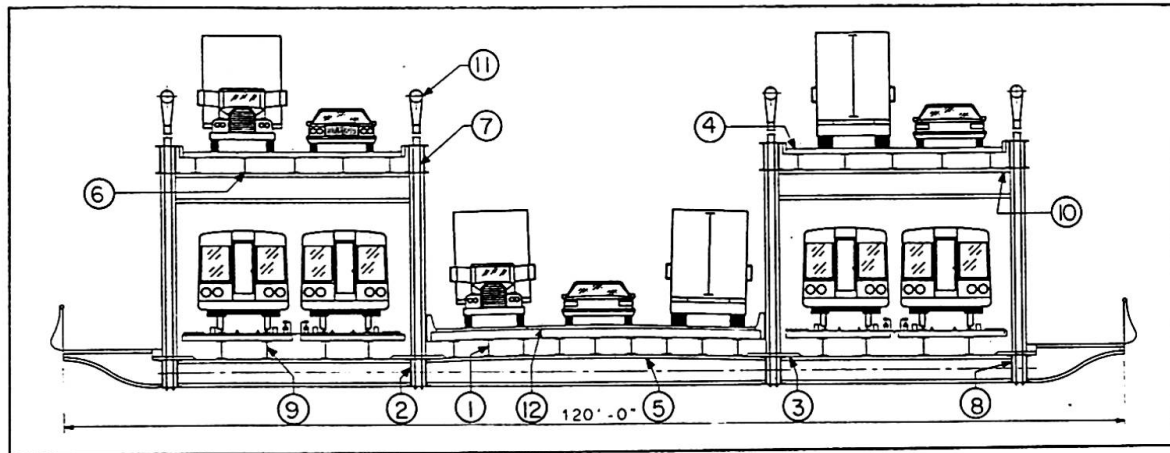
CROSS SECTION OF MANHATTAN BRIDGE, NEW YORK - Major Defects Reported
